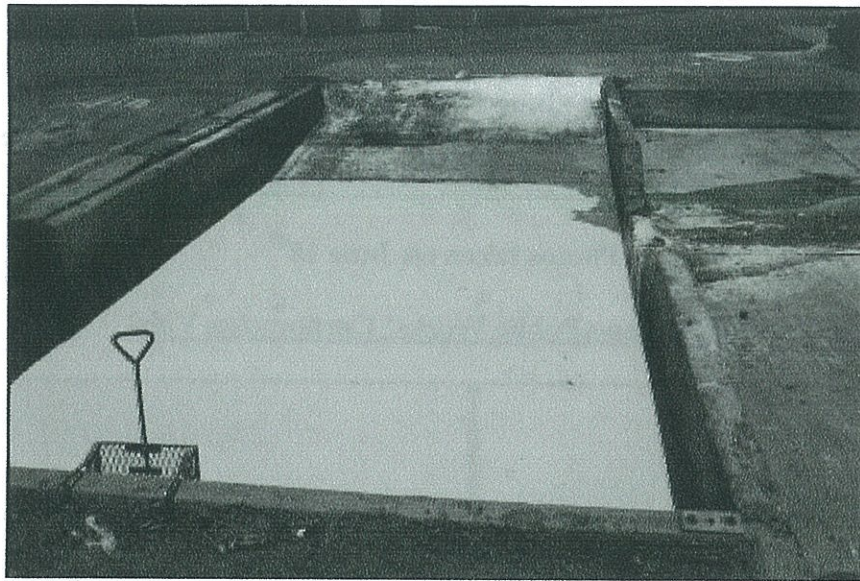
This is a picture of the sump that accepts waste water from the equipment wash area and the wet street sweeper waste.
